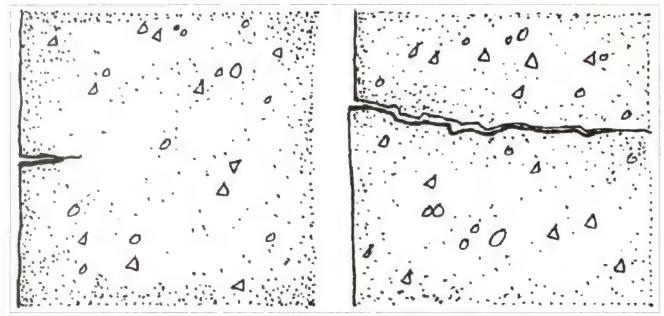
Typical concrete cracks. The image on the left illustrates a small, surface crack that can be repaired by grouting and sealing. The image on the right illustrates a large, structural crack that will require extensive repairs. Consultation with a structural engineer is recommended to determine a preferred method of repair (Freeman et al., Seacoast Fortifications Preservation Manual, 147).
